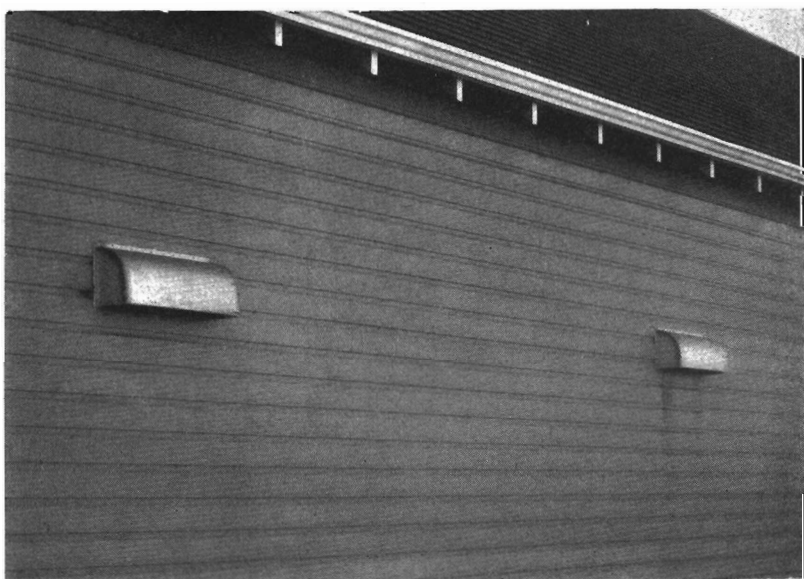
Outside of the wall of the battery brooding room showing hoods over ventilating outlets to prevent strong winds from blowing into the room.
